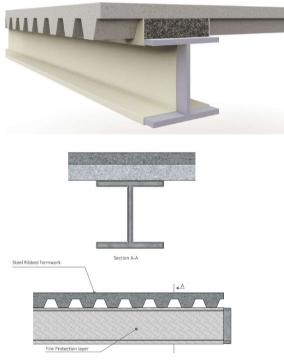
Nullifire SC901/902 protected steel beam interfacing with composite floor – Steel beam perpendicular to voids
